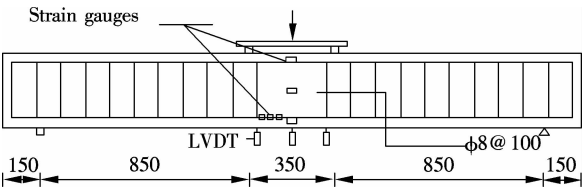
Dimensions of beam and loading configurations (unit: mm)
